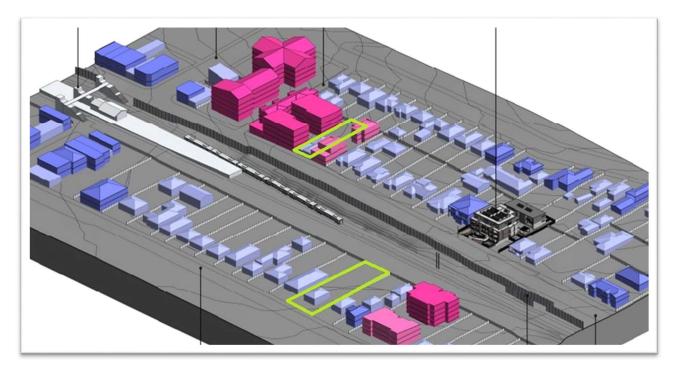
Analysis of building height and scale surrounding the site. 4 storey developments with DA approvals highlighted in green
